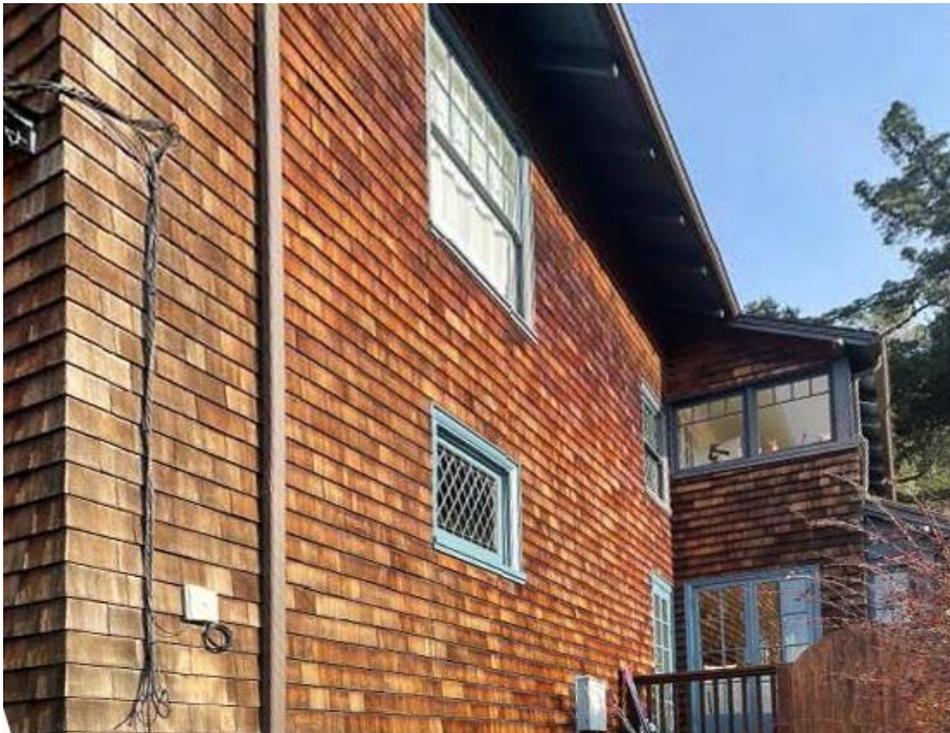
Side (south) showing the building's L- shape clad in unpainted wood shingles
